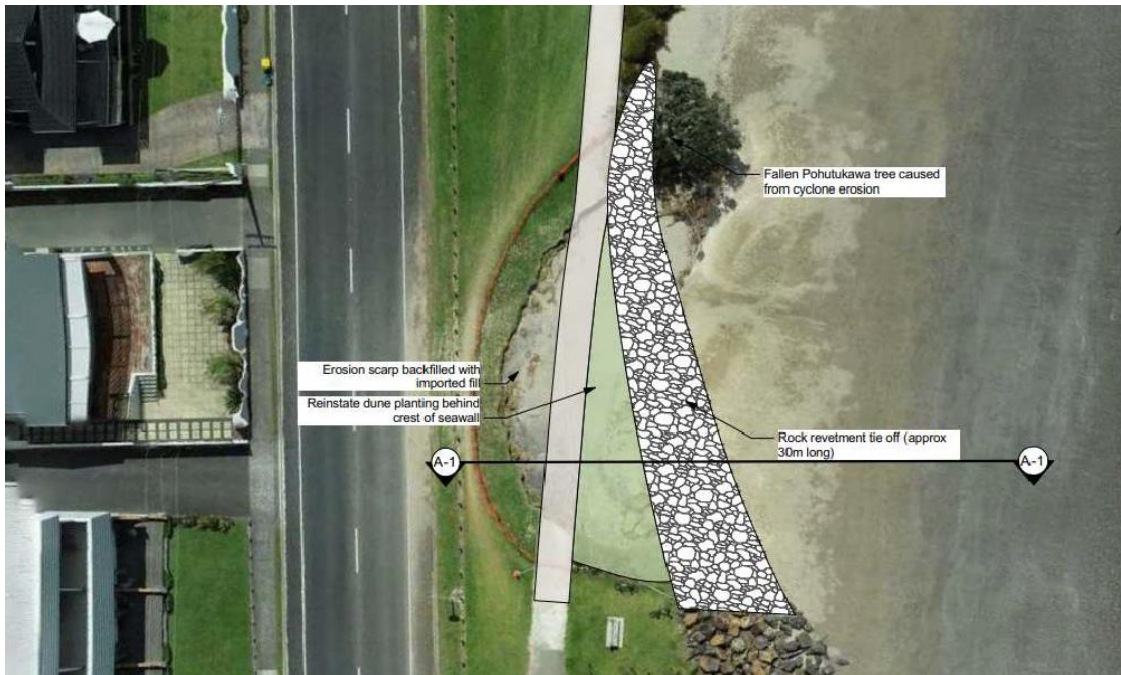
Indicative Tie-Off Concept Plan sourced from Application AEE (Figure C).
